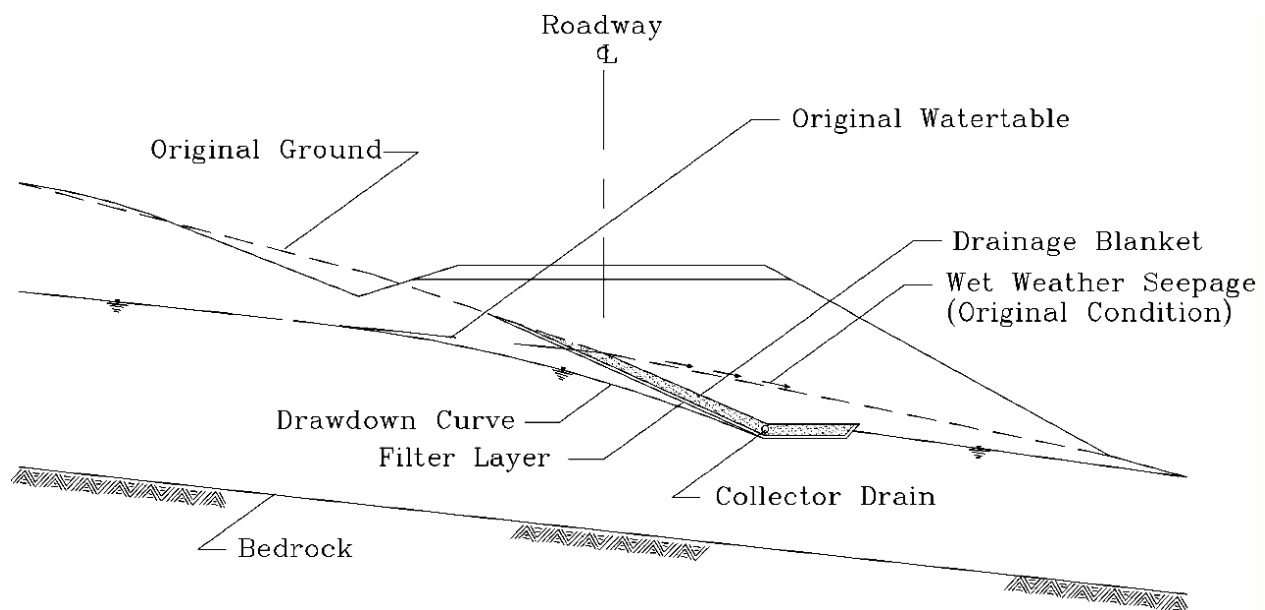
Drainage blanket beneath side hill fill outletted by collector drain (redrawn from: Moulton, 1980).
